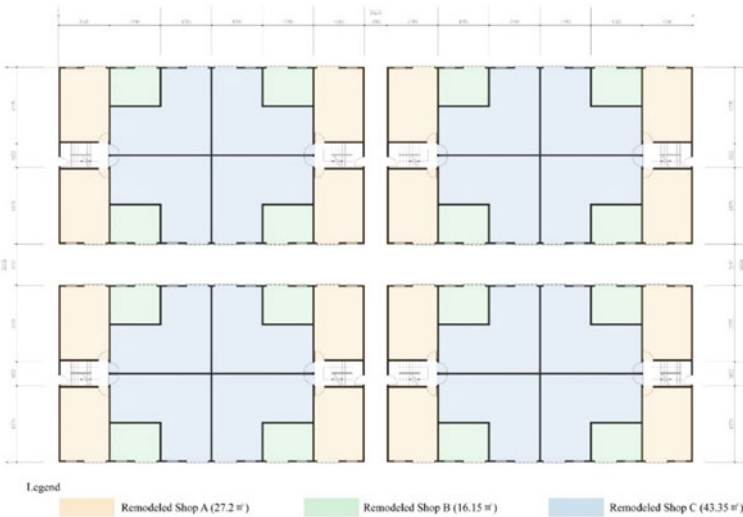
Floor plan of the Son Lei house ground floor residential converted into a shop
